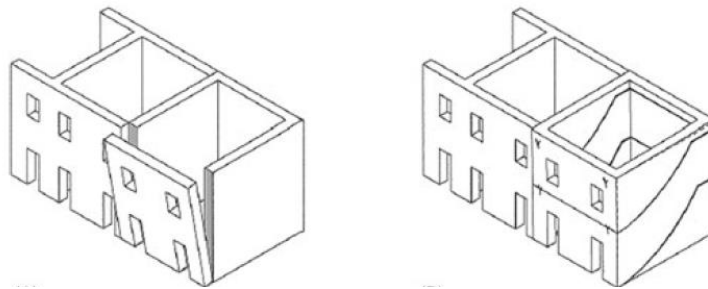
Failure modes for buildings: (a) without cross connections; (b) with cross connections(Carocci 2001)
